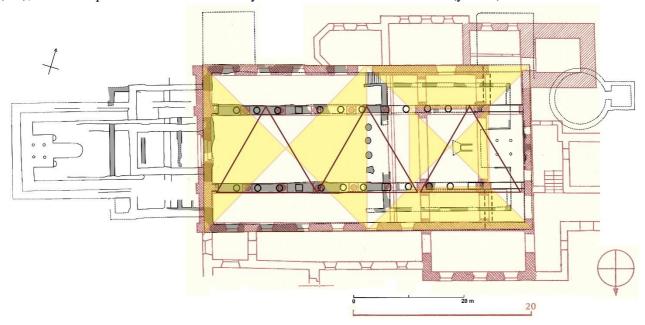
Plan of the excavated foundations of the carolingian collegiate church of Bischofszell (after H. R. Sennhauser), with suggested places of columns and pillars.
